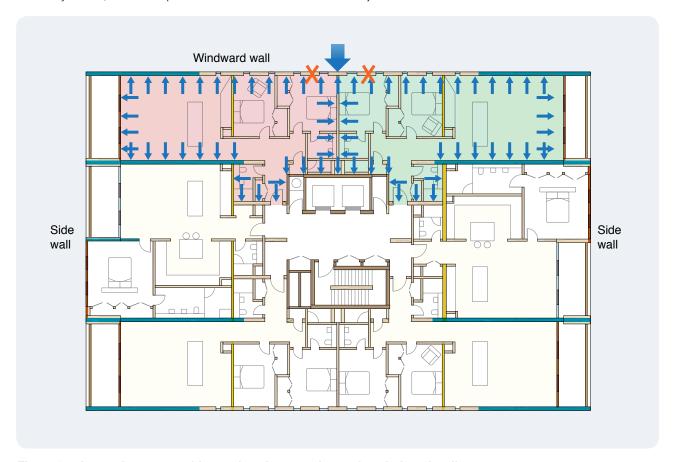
Internal pressure with openings in two units on the windward wall.
